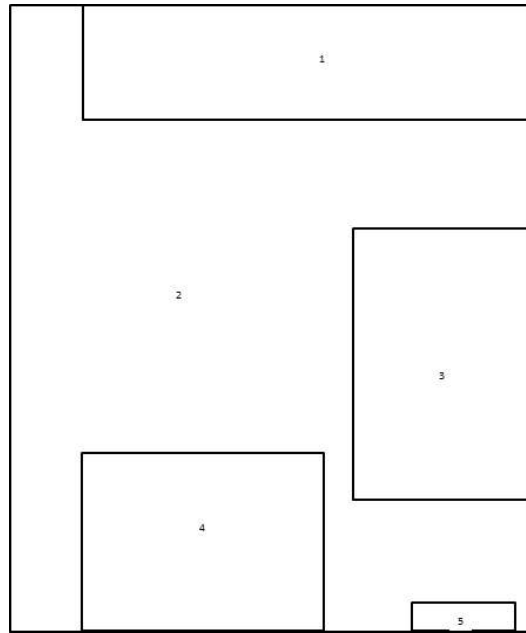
19 Plan 3rd floor Latar Ijen Resto & Coffeeshop
